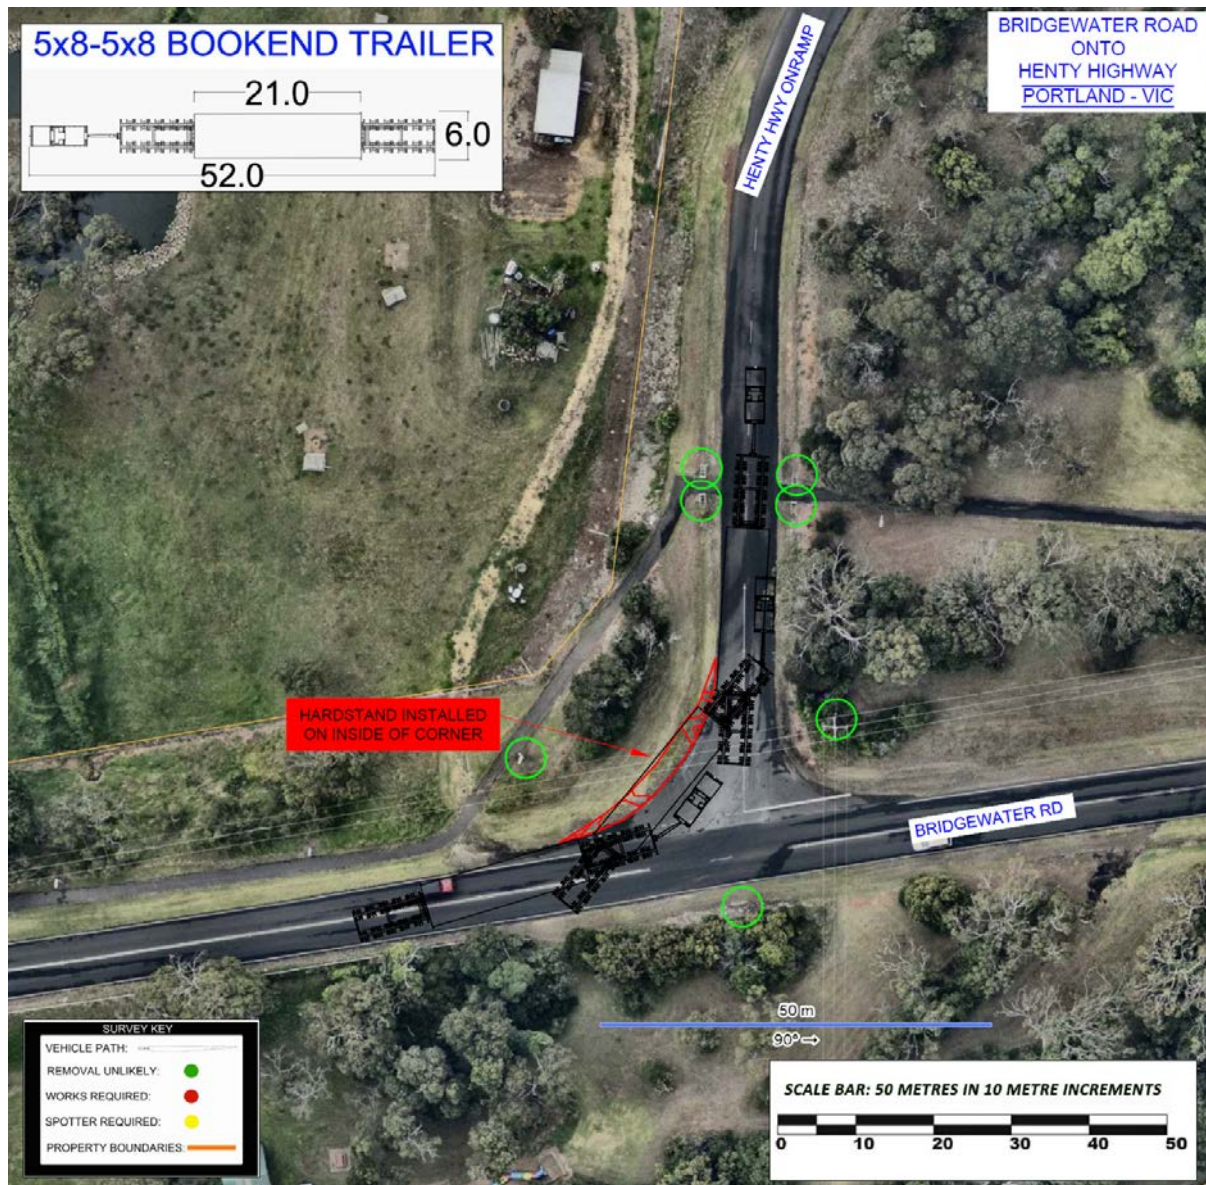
Bridgewater Road onto Henty Highway on Ramp
